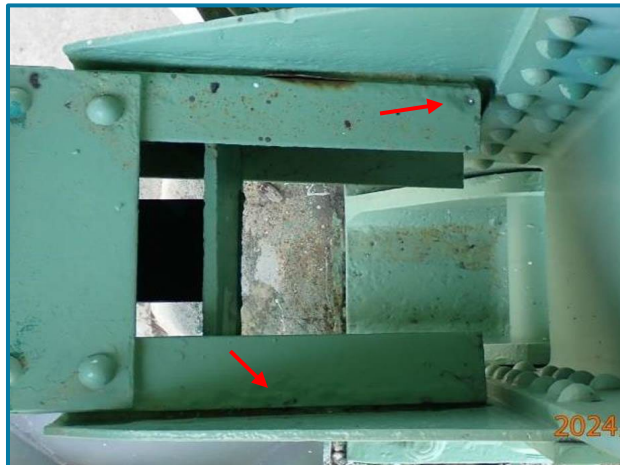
3/16” deep section loss to the top flange (L19L20 of the South Truss, Span 6).
